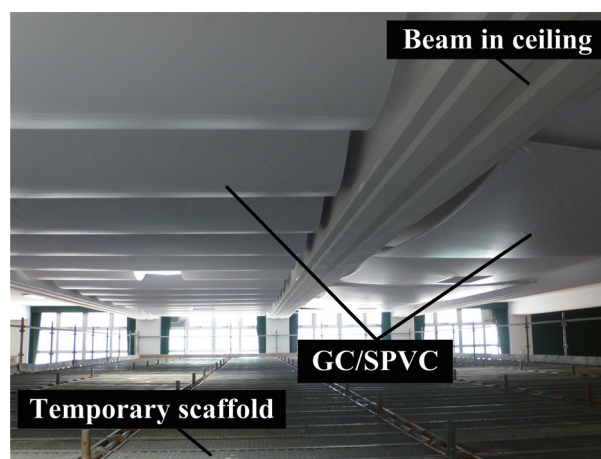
Test construction of GC/SPVC for suspended ceiling membrane.
